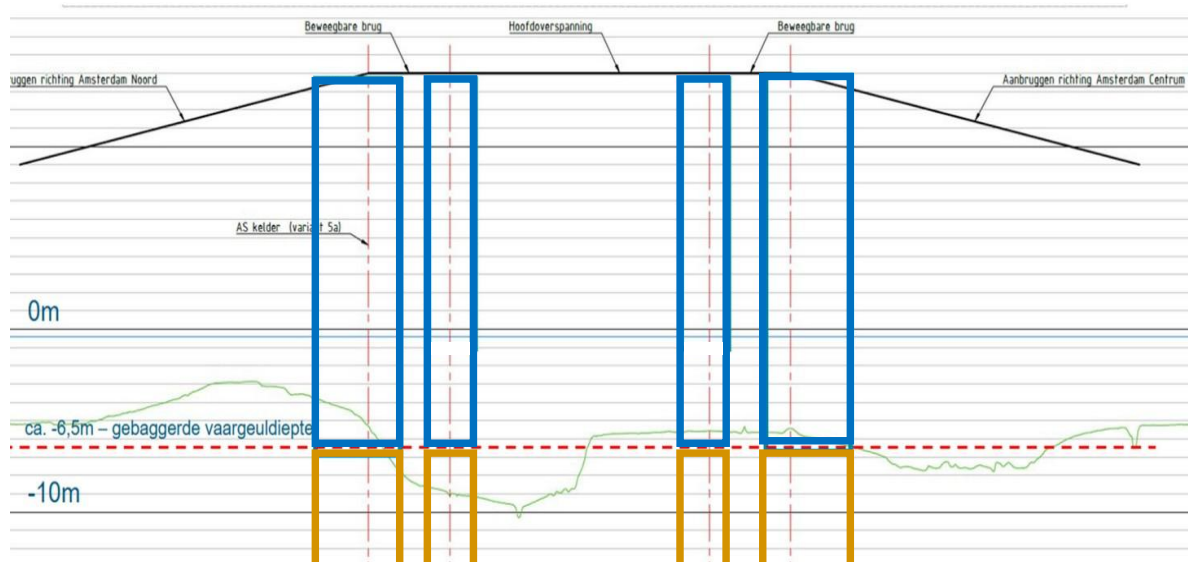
System 1: Submerged foundation piles in the IJ River [34]
